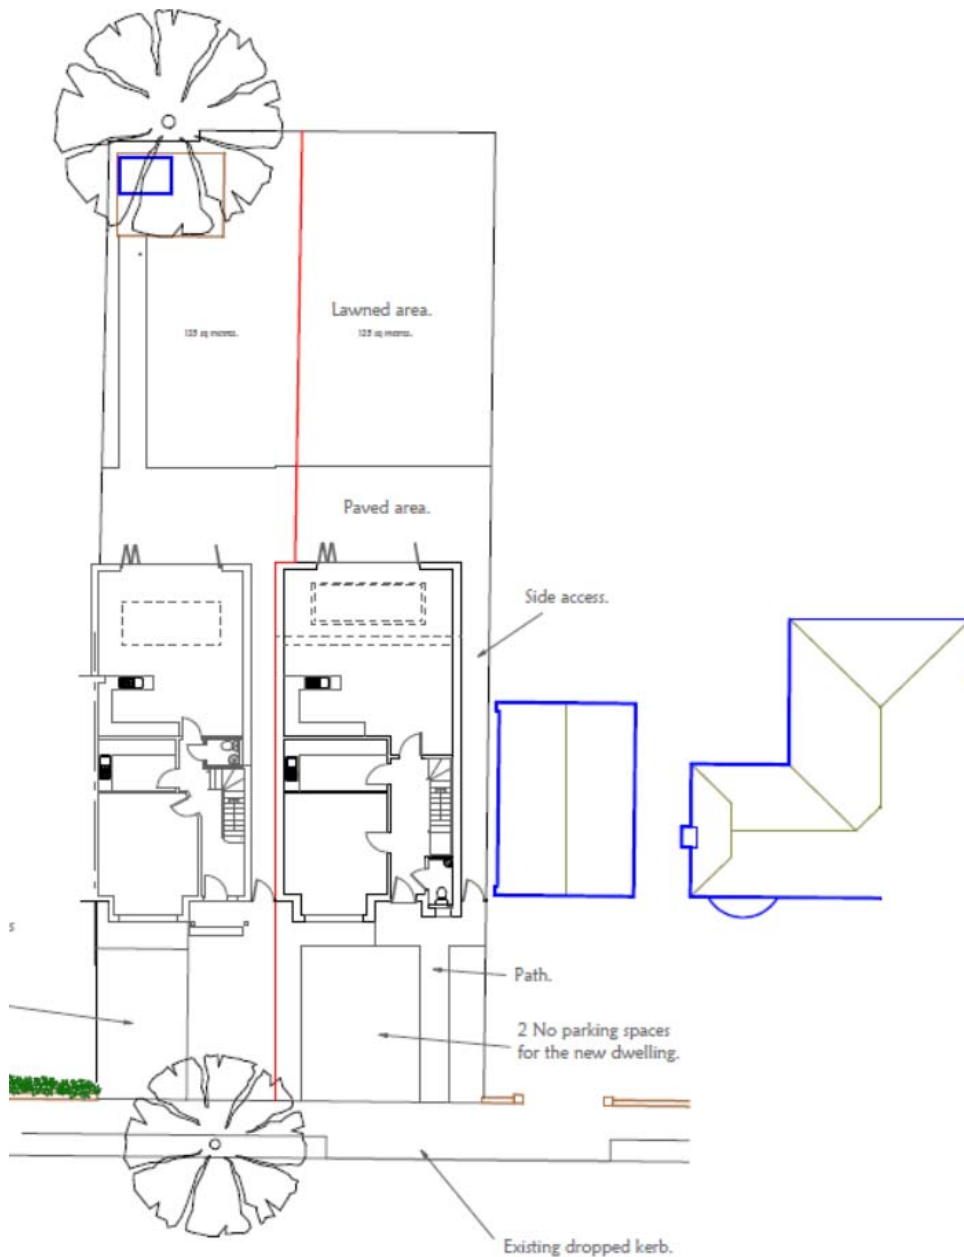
Ground floor plan proposed site showing proposal in relation to neighbouring properties
